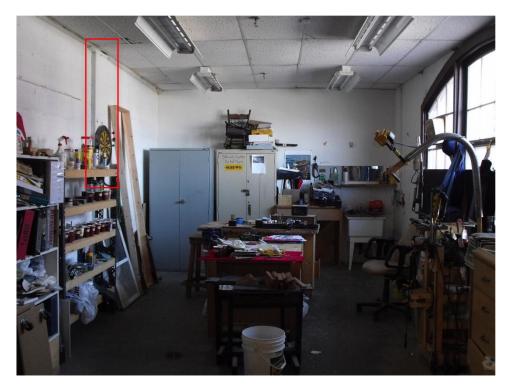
The paint room, looking west. Note the boxed-in cast iron beam inside the cinderblock wall (red).
